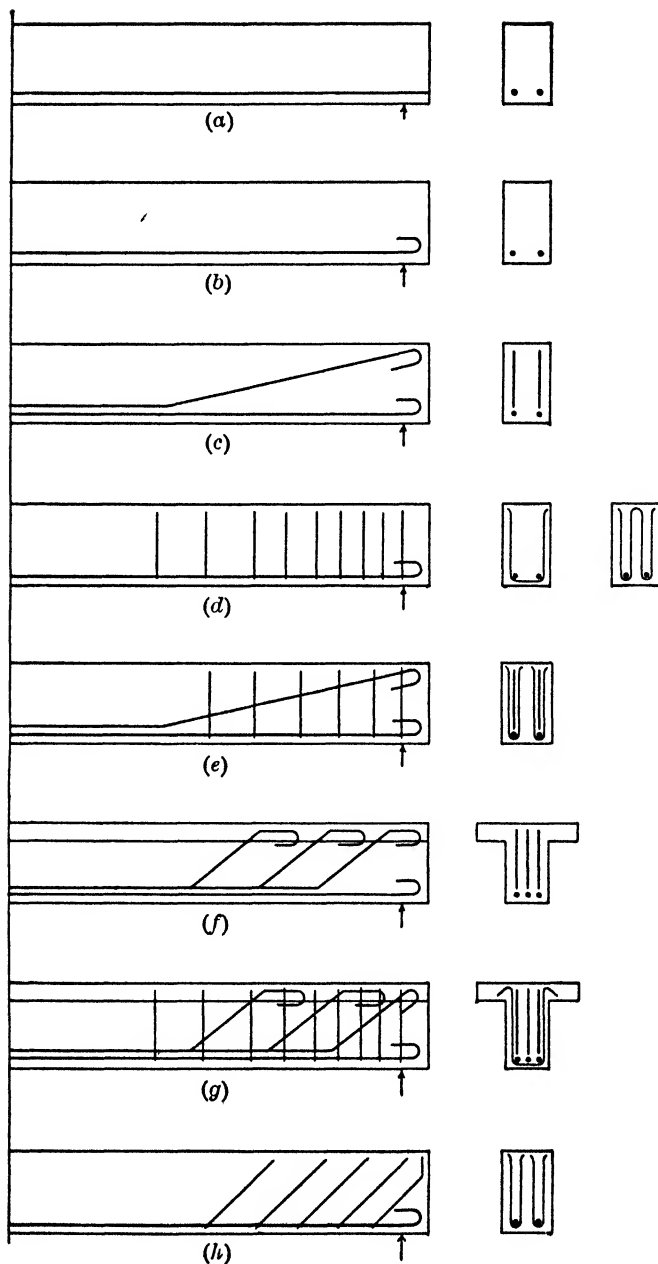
General Methods of Arranging Beam Reinforcement.
